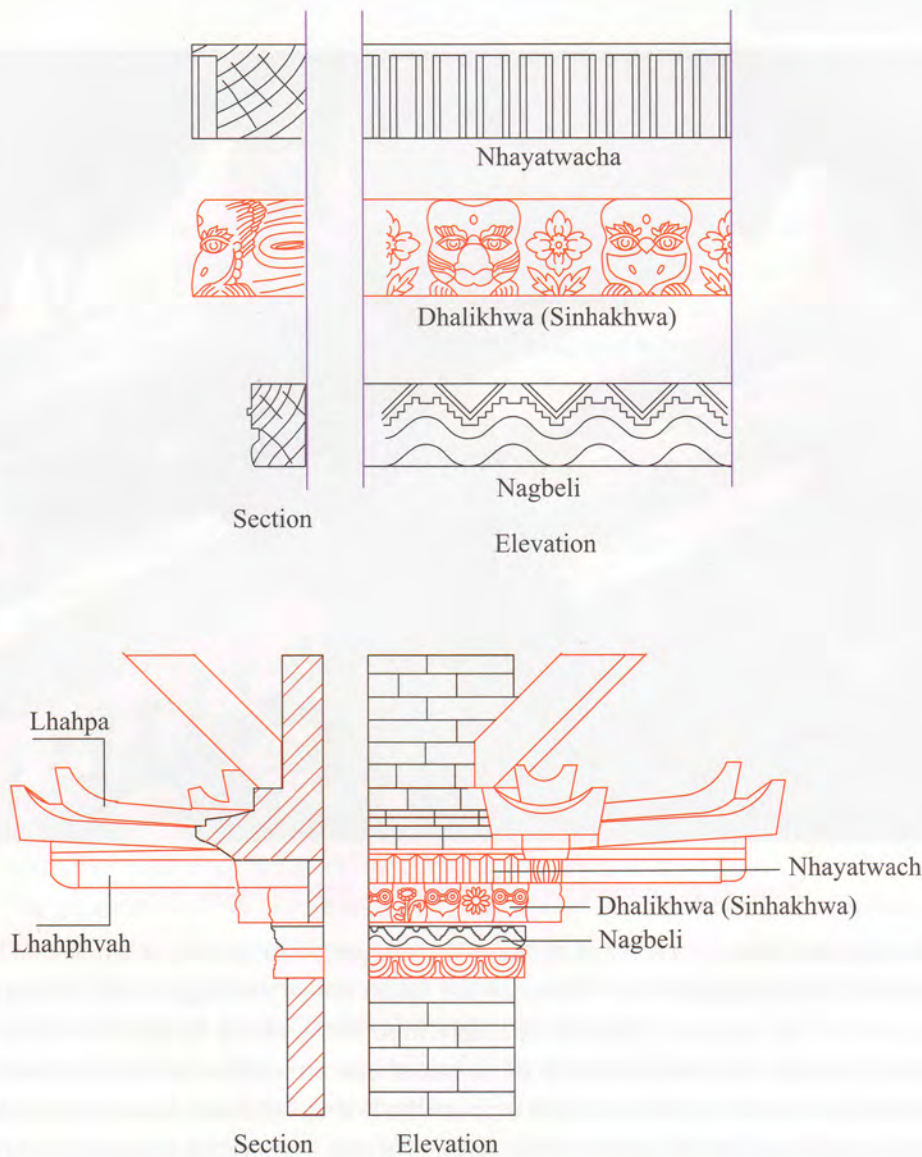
Section & Elevation of Wooden Cornice (W. Korn)
